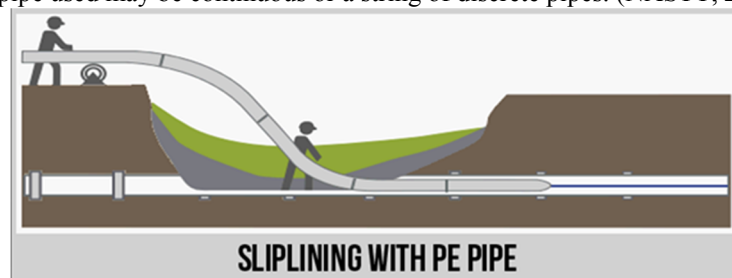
Typical sliplining process. (Trenchless Pipe Solutions, 2017)
